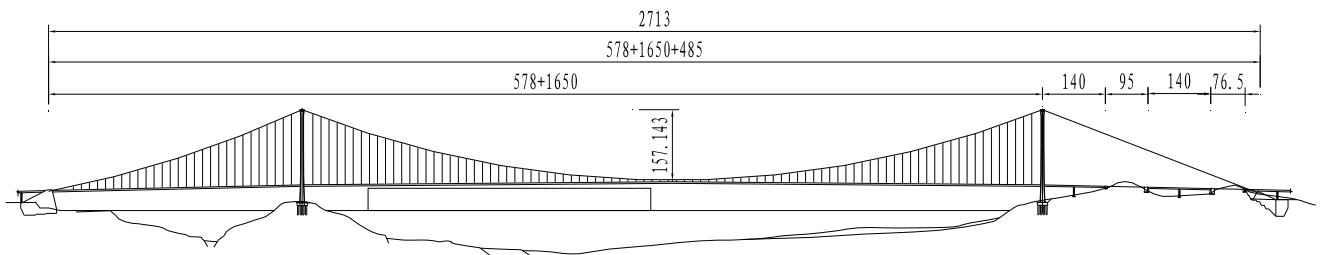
Elevation of the Zhejiang Xihoumen Bridge (Dimensions in m)
